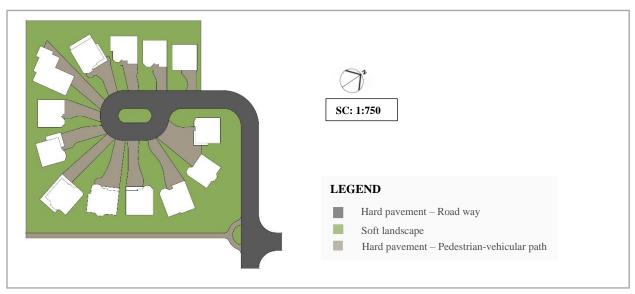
Cul-de-sac Rue Du Collège-Beaubois, Floor plane
